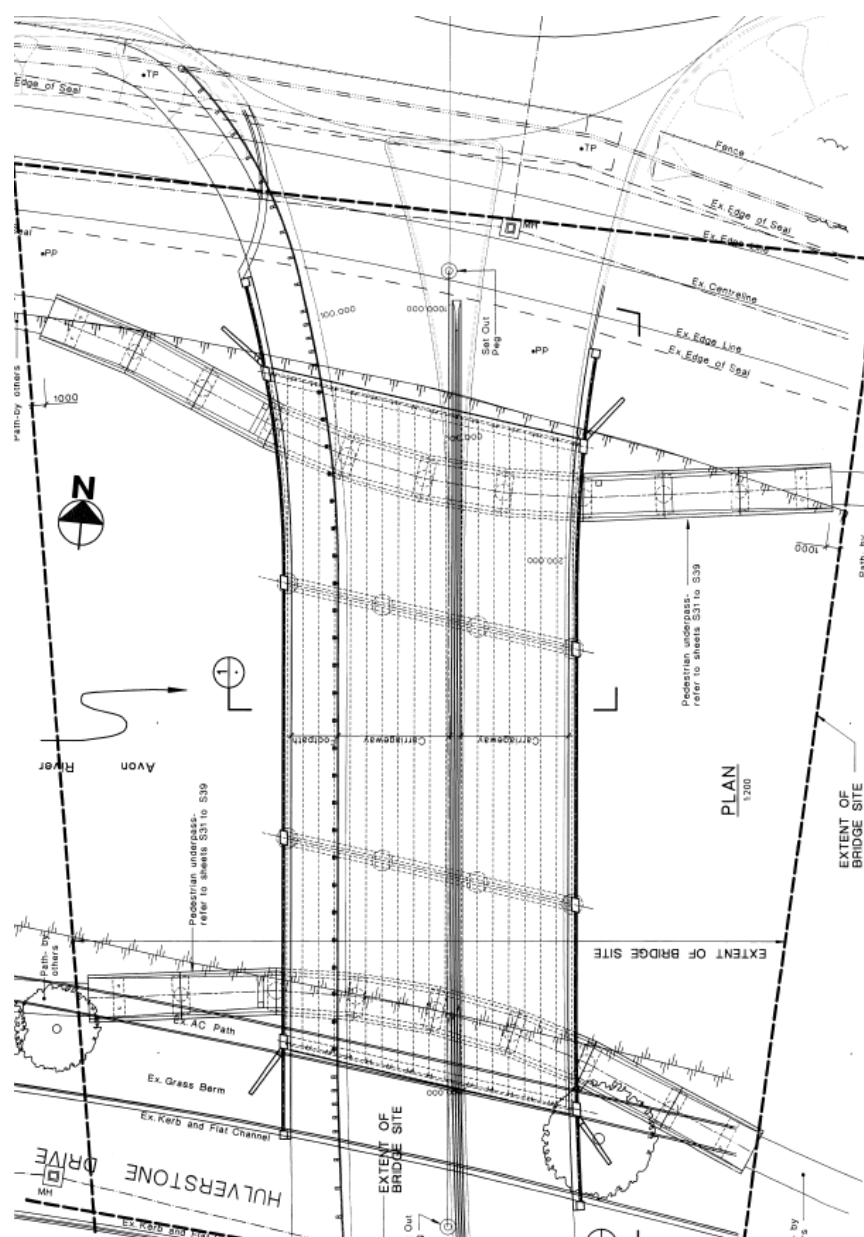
Plan view of ANZAC Bridge, Christchurch City Council design drawing
